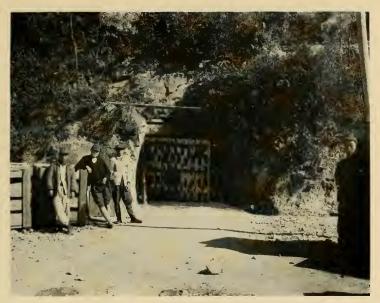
Small tunnel used for installation of machine tools, Kukuri plant.
